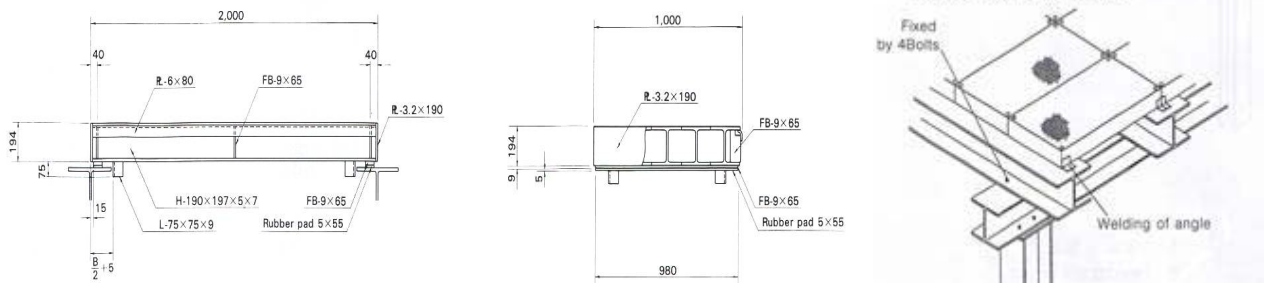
Typical steel decking elevation (L), end view (C) and installed (R) (Hirose, c.1996).
